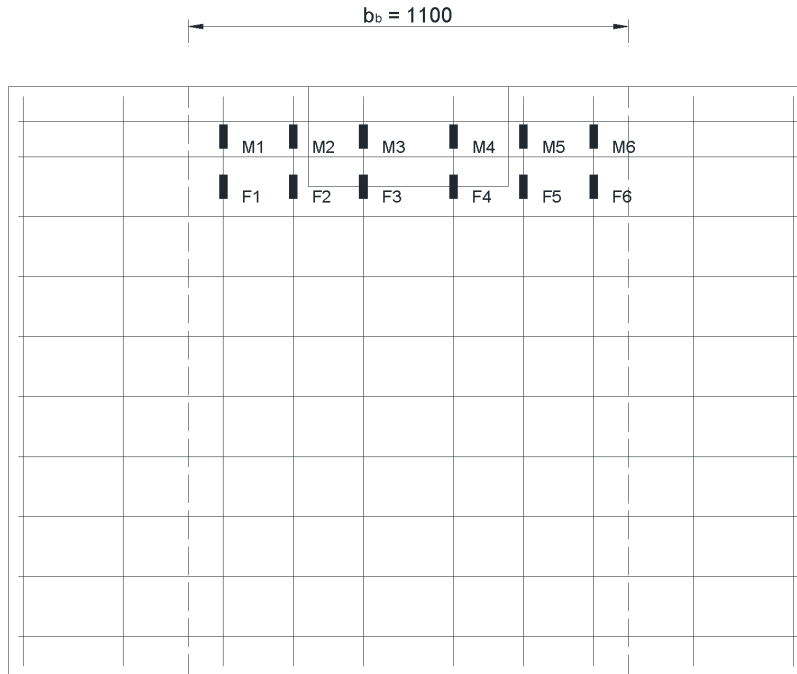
Strain gauge layout for Specimen 1 (units in mm)
